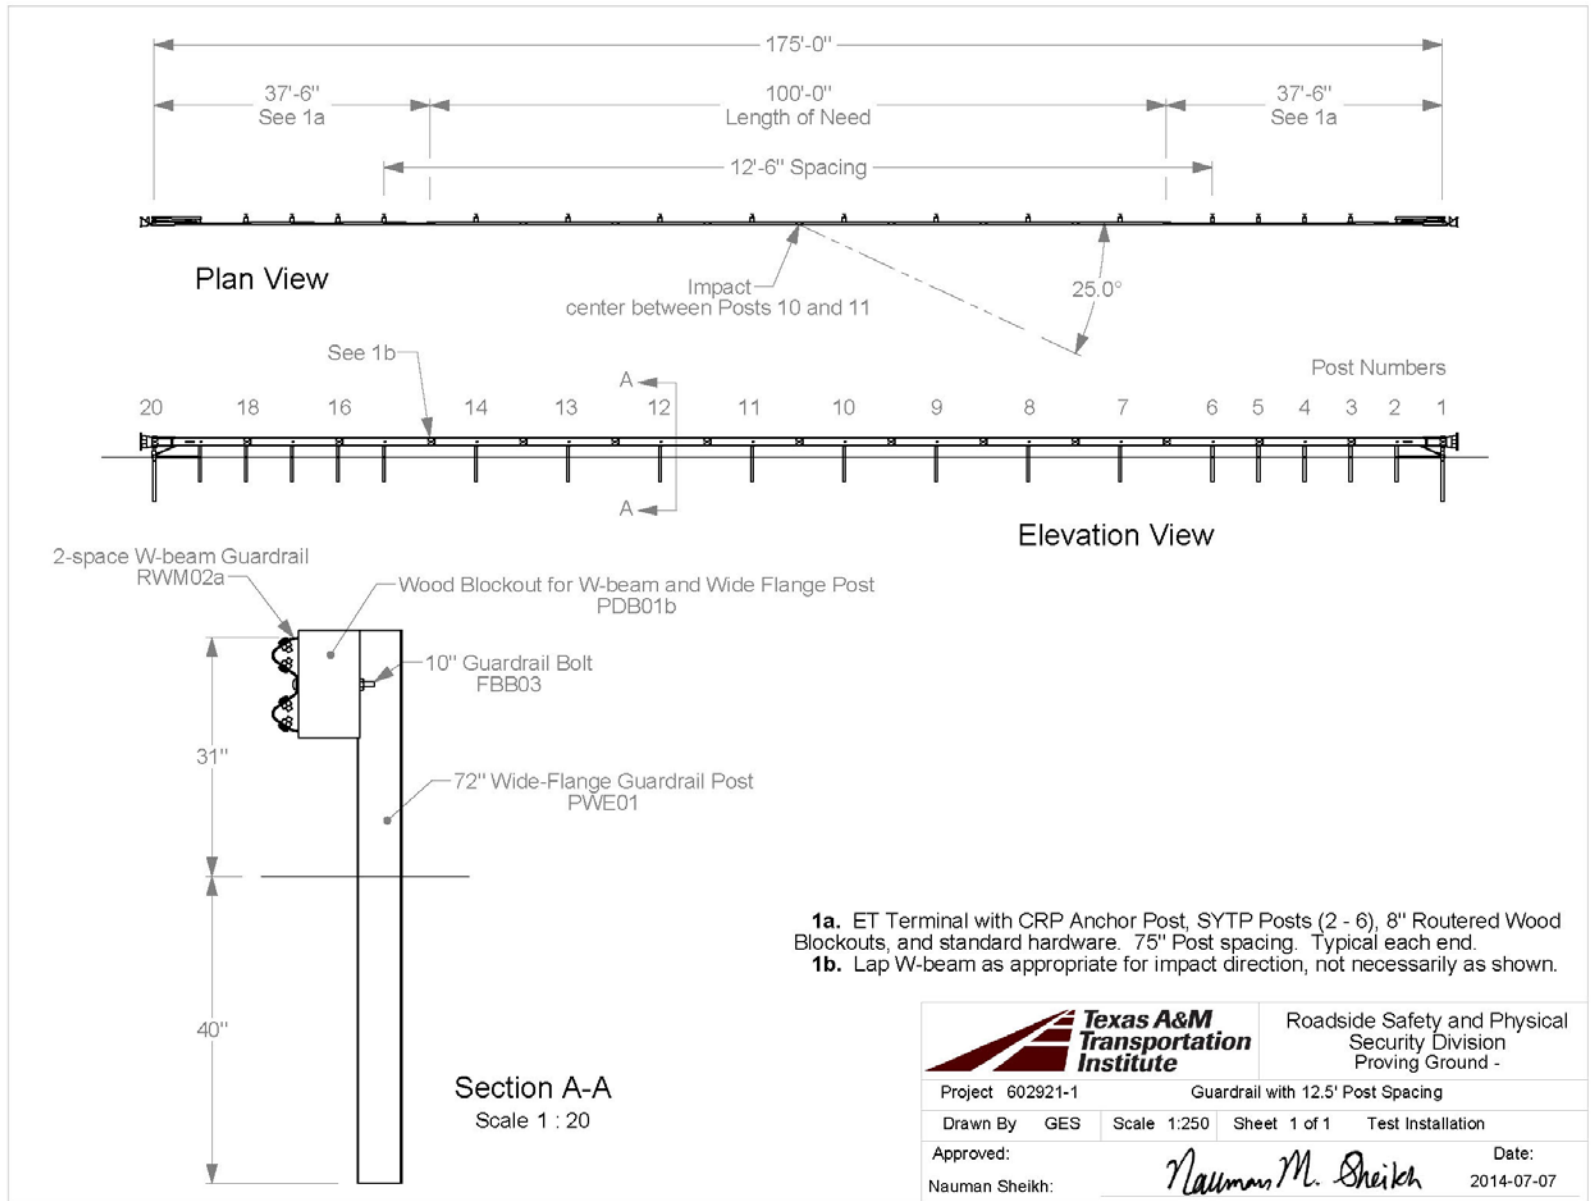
Details of the 31-inch Guardrail with 12 ft 6 inch Post Spacing.
